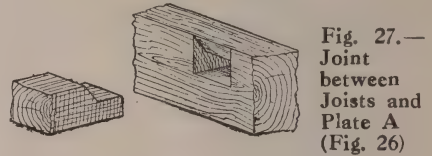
Joint between Joists and Plate A (Fig. 26)
